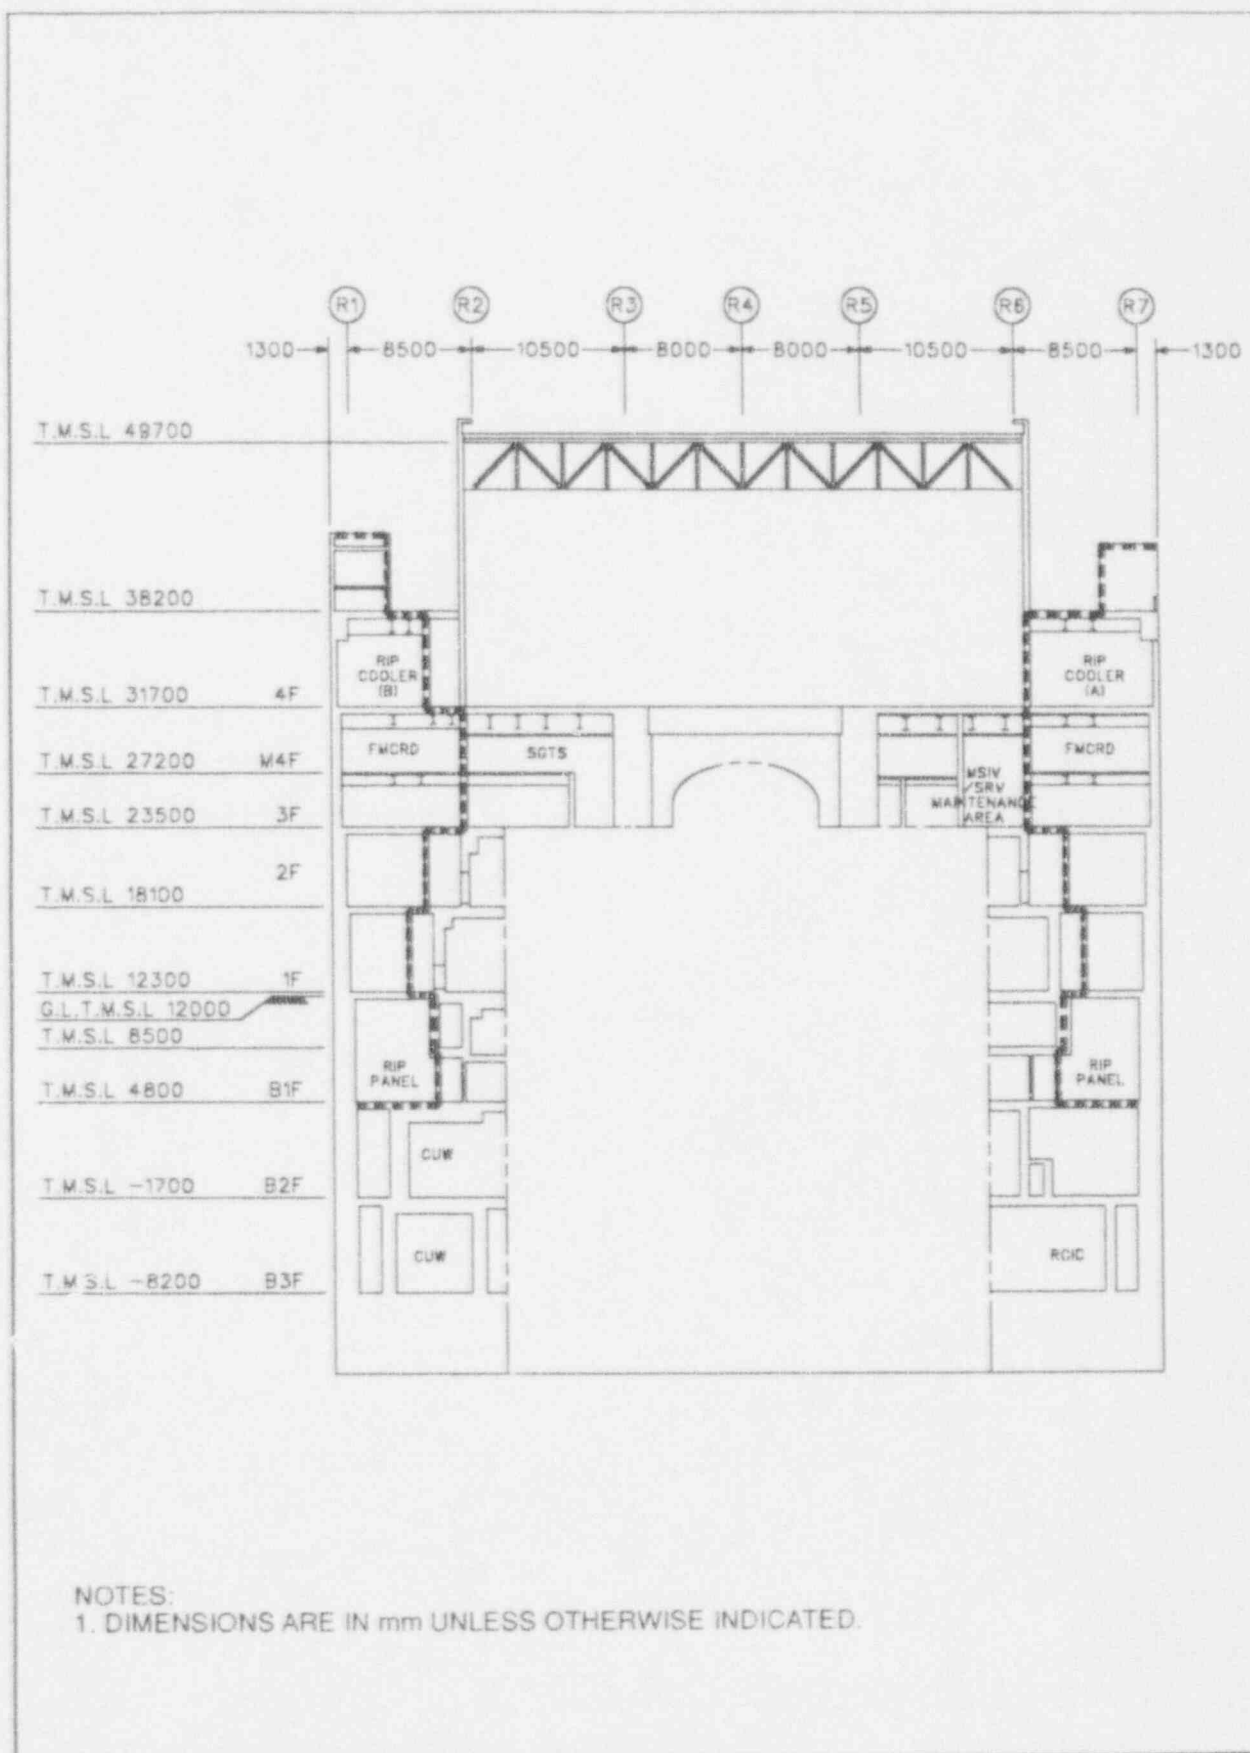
Reactor Building Arrangement—Section B-B
